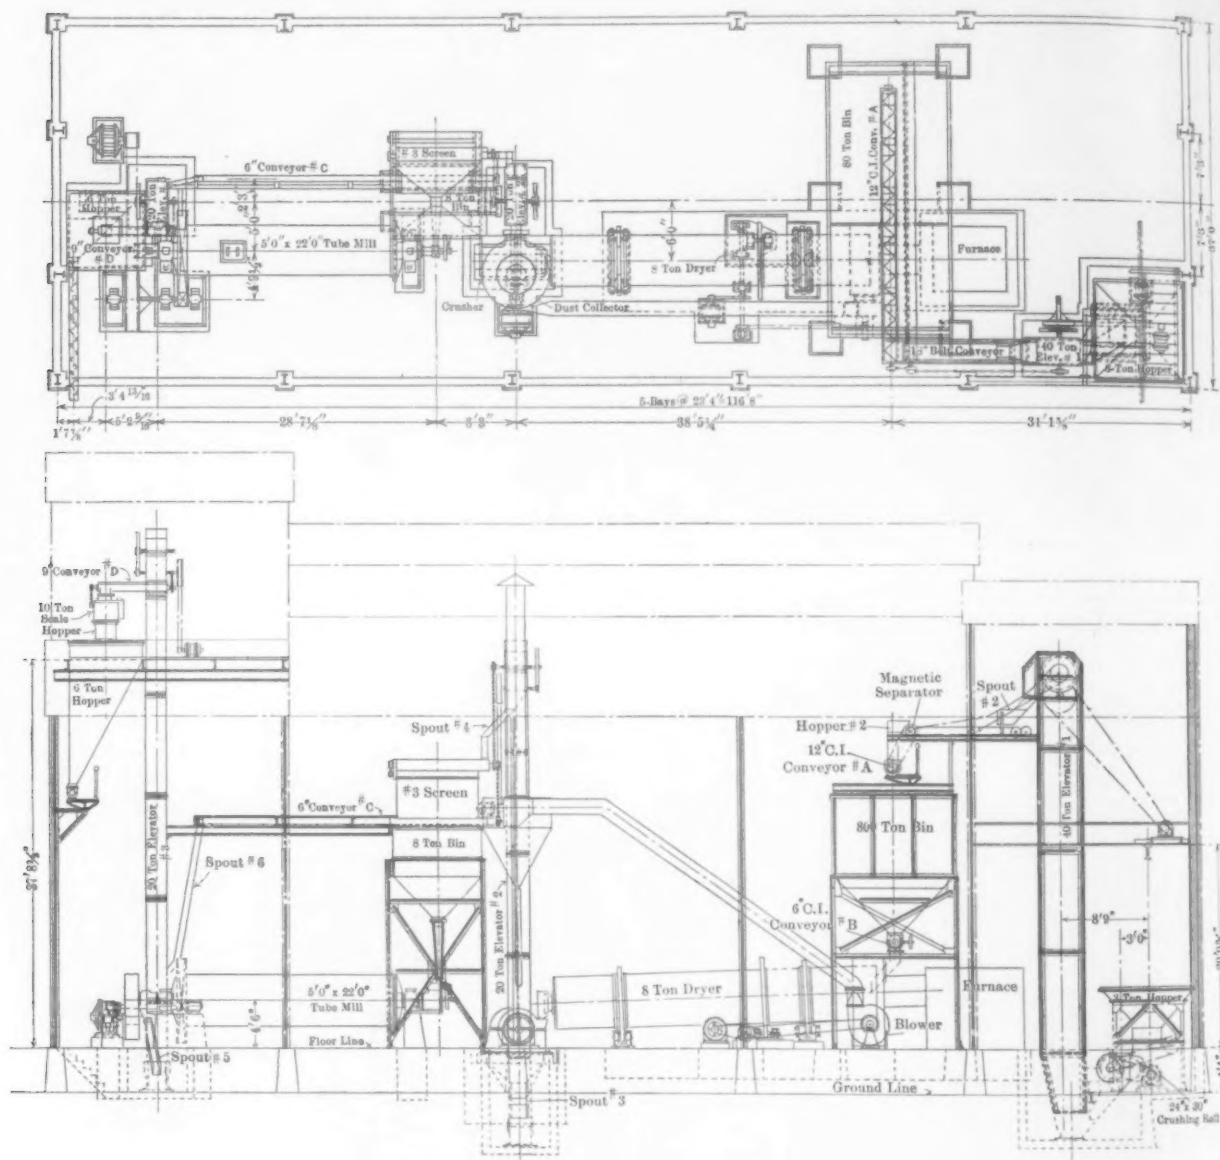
Elevation and Plan of Coal Pulverizing Plant
